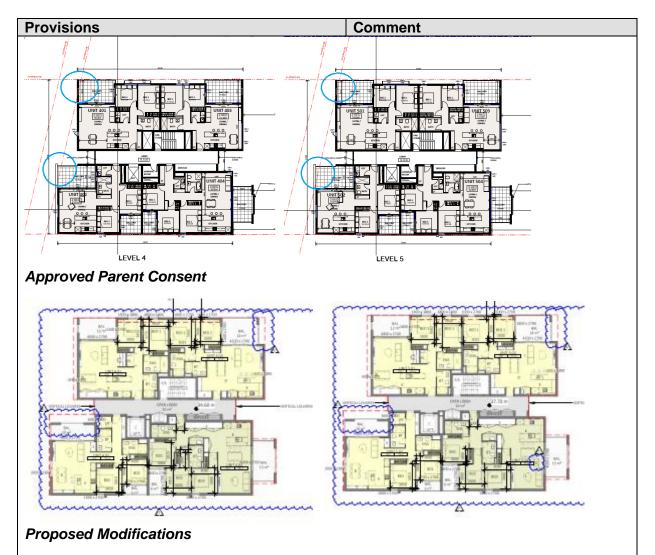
Excerpts from Level 4 and 5 Plans showing approved plans and as modified.
